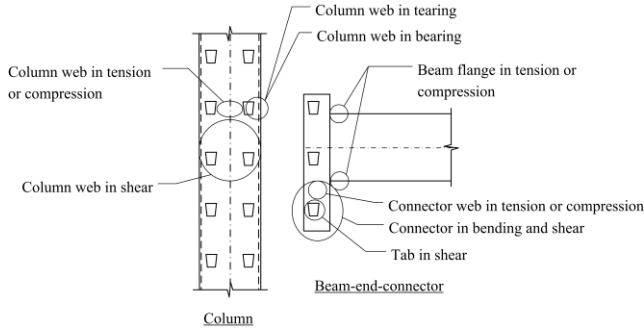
Basic components of beam-to-column connections in steel storage racks
